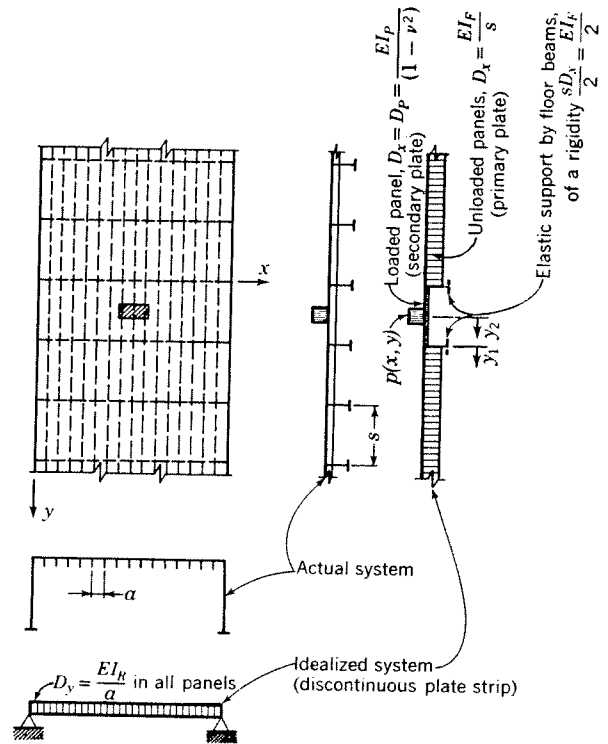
Bridge deck treated as an orthotropic plate strip, with consideration of the discontinuity in the loaded panel
